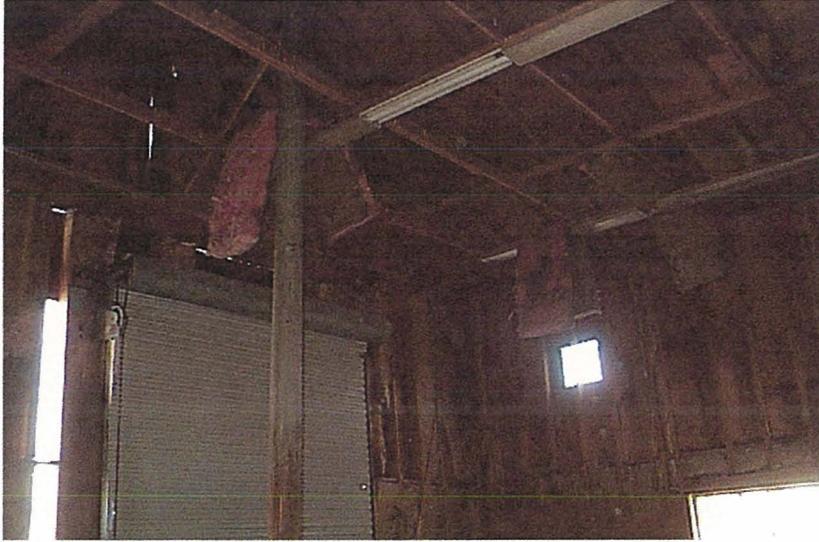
Taken by E. Seum on 4/18/00. Shows insulation hanging down inside building shown in photos 31 & 32.
